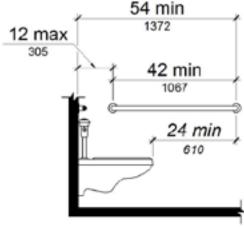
B-604.5.1 SIDE WALL GRAB BAR AT WATER CLOSETS
